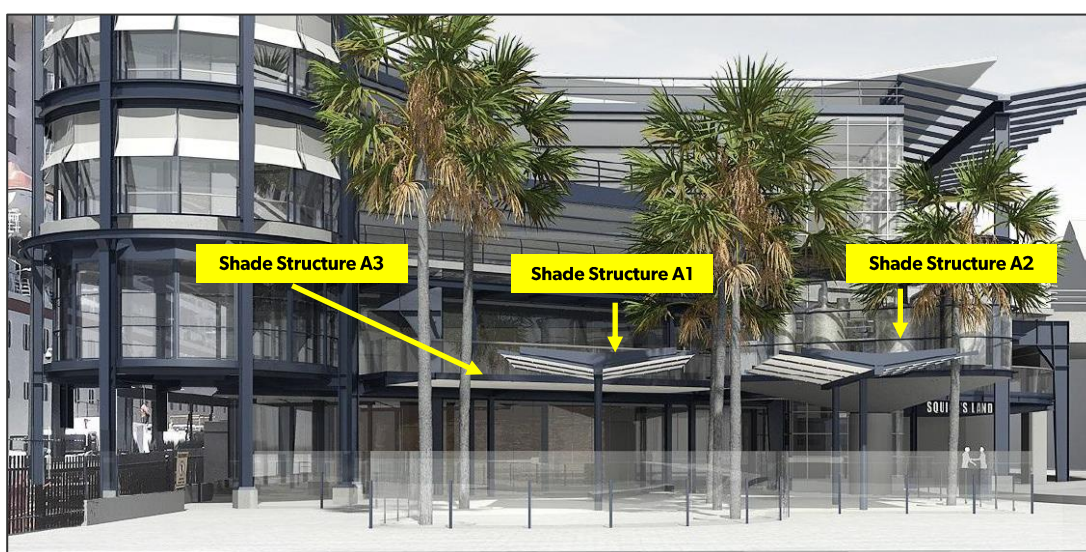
| Location of proposed shade structures – view to the south (Base source: Applicant's RtS)
